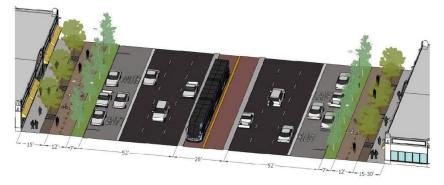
Proposed 200-foot Cross-Section - Between I-696 and 14 Mile Road
